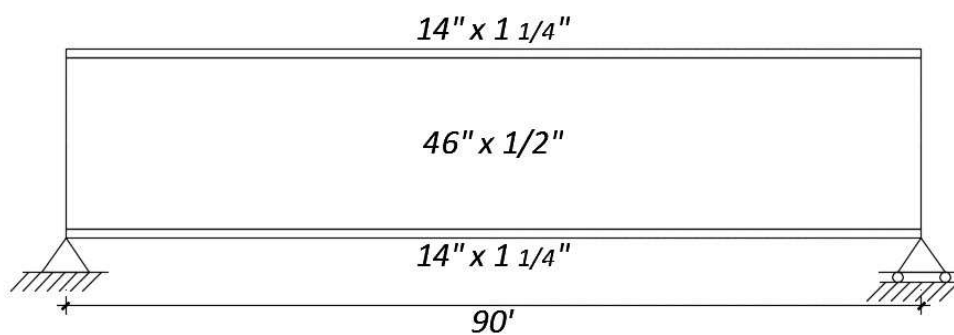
Sketch of the typical 90' one-span composite steel I-girder bridge
